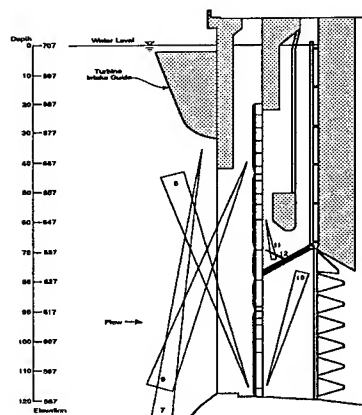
Cross-section of Rocky Reach Dam at Unit 1, north intake showing the various transducer mounting locations.
